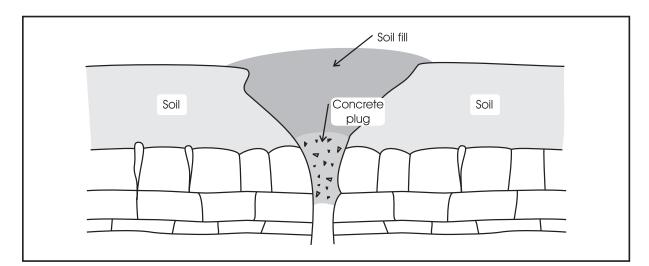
Mining Out Clay-Filled Cavity; Concreting
